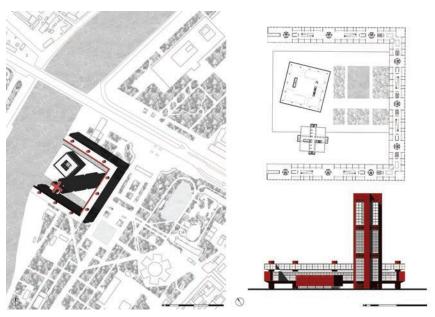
Left, volumetric plan. Right, ground floor plan and elevation of the Ideal Museum of the Vkhutemas.
